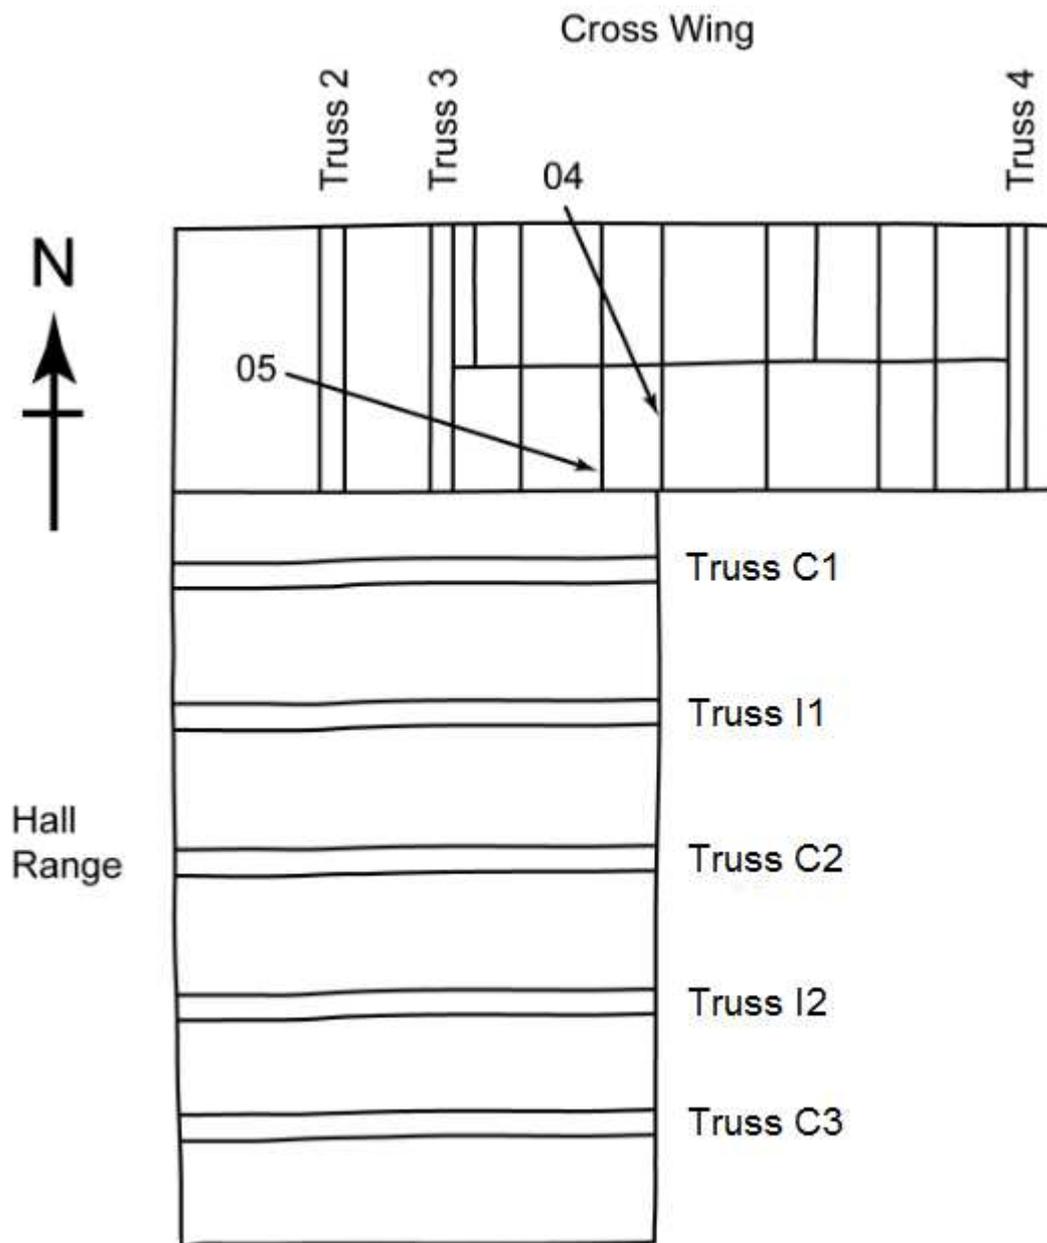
Plan of hall and cross-wing, showing truss position and location of samples 04 and 05
